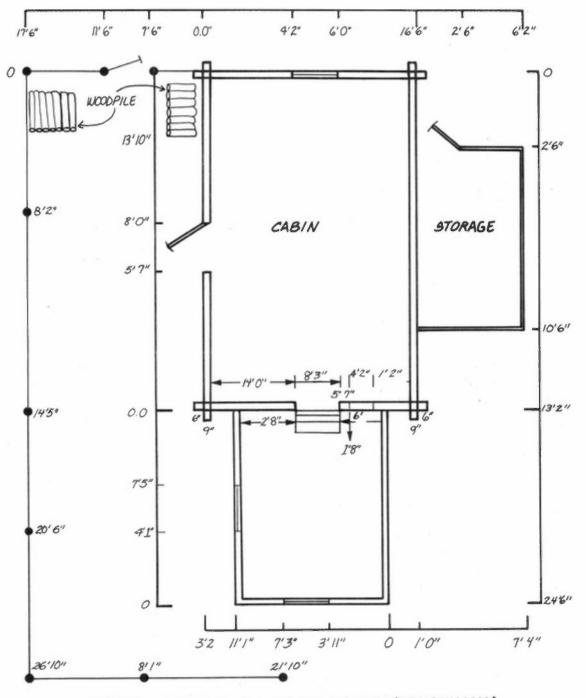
FLOOR PLAN - 30 MILE CABIN (BRUSHKANA)
